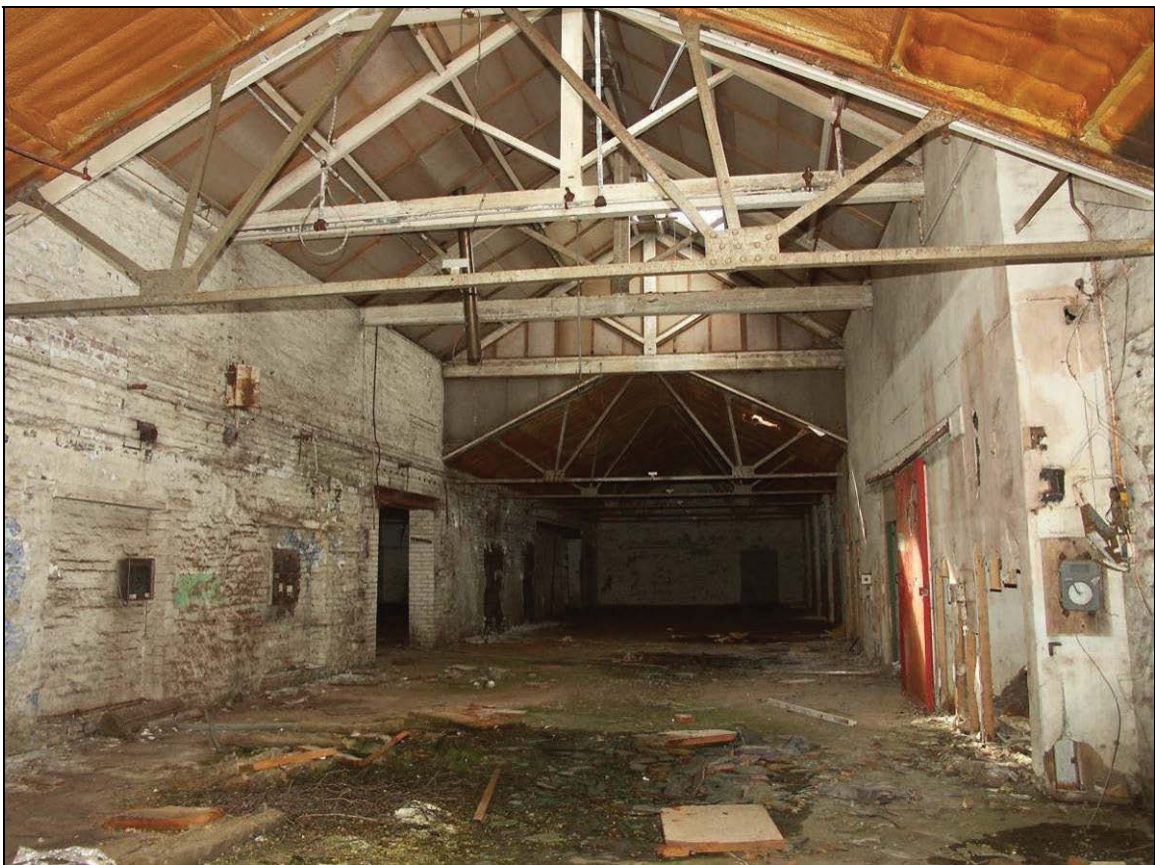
Roof structure of Building H with three king-post trusses in the central area
